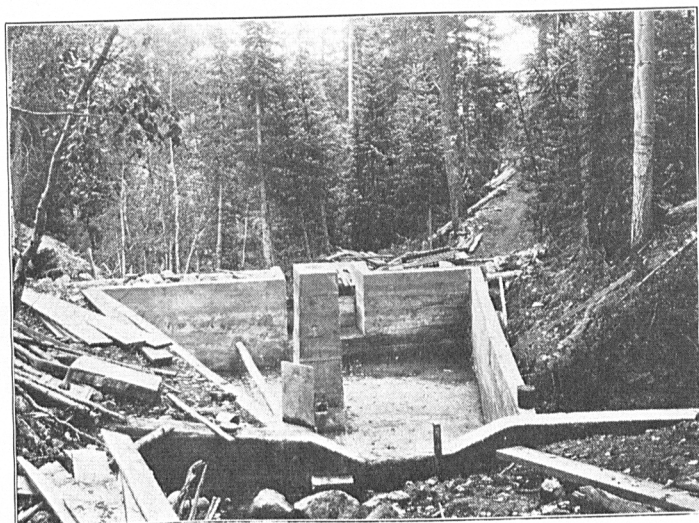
Completed basin at Dam A from upstream end. Column in center—still well, later enlarged for 20-inch float.
